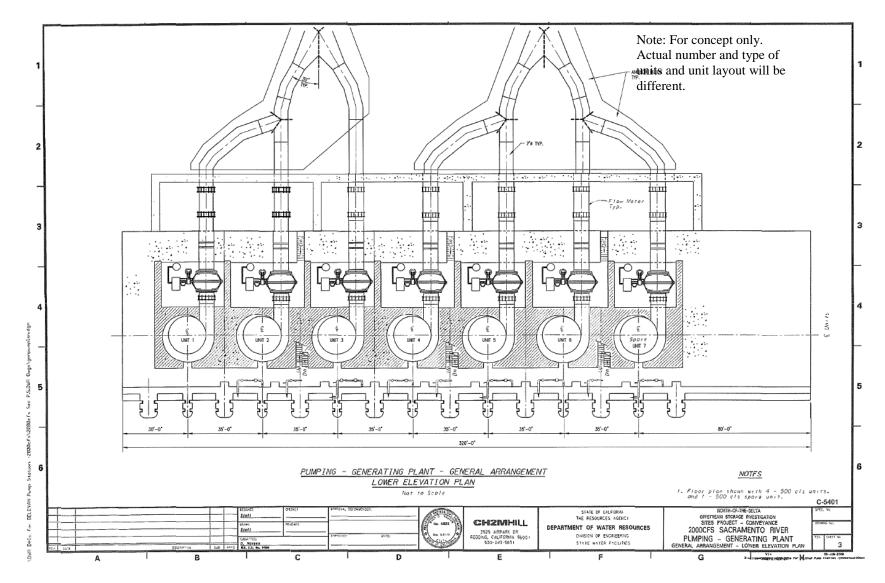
Sacramento River Pumping/Generating Plant Lower Elevation Plan
